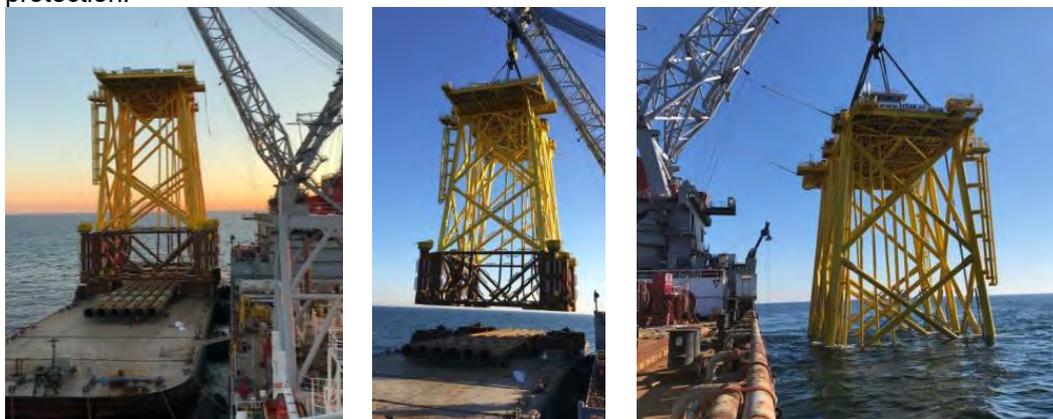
Installation of Borssele Alpha jacket (700MW platform)
